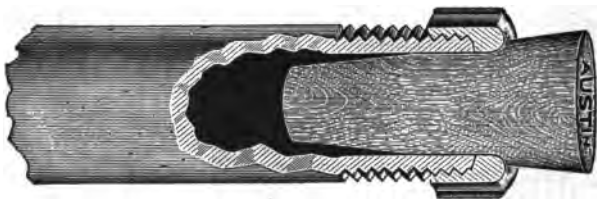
,274.—Austin conduit plugs for corking conduit systems during construction to keep out dirt, plaster, concrete, etc. These plugs are especially needed in poured concrete work.
